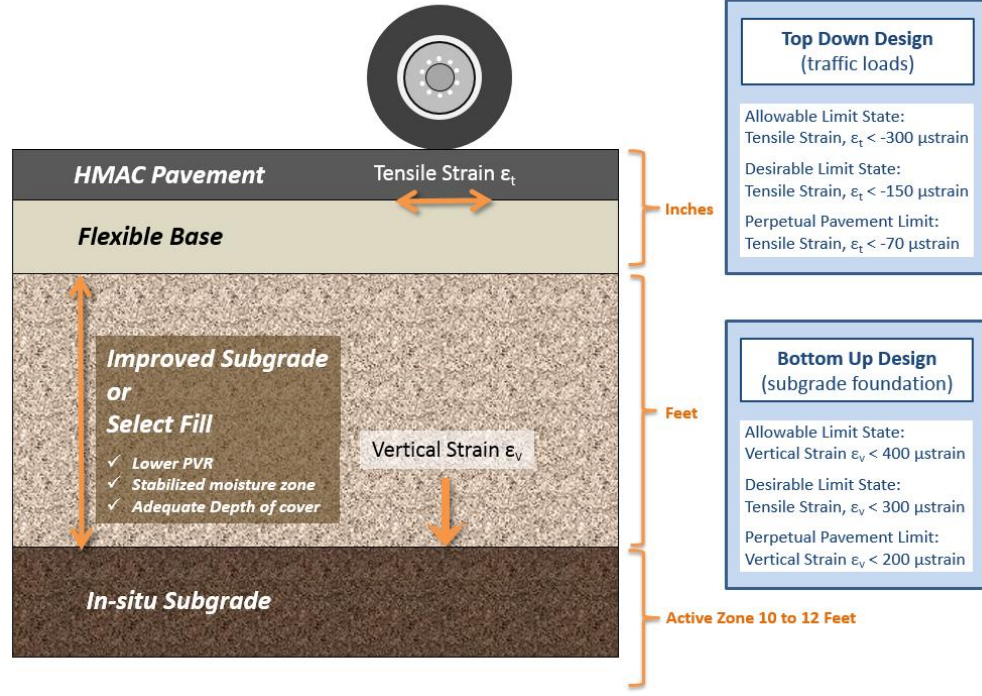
Top Down and Bottom Up Pavement Design – Flexible Pavement
